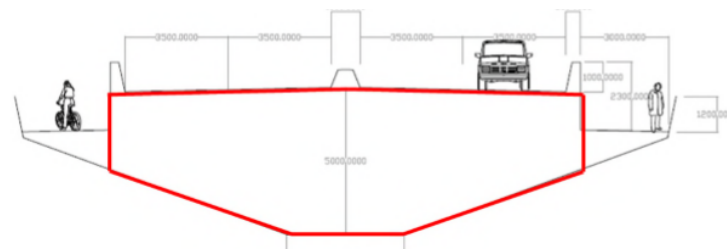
Cross section of floating bridge; provided by Reinertsen AS
